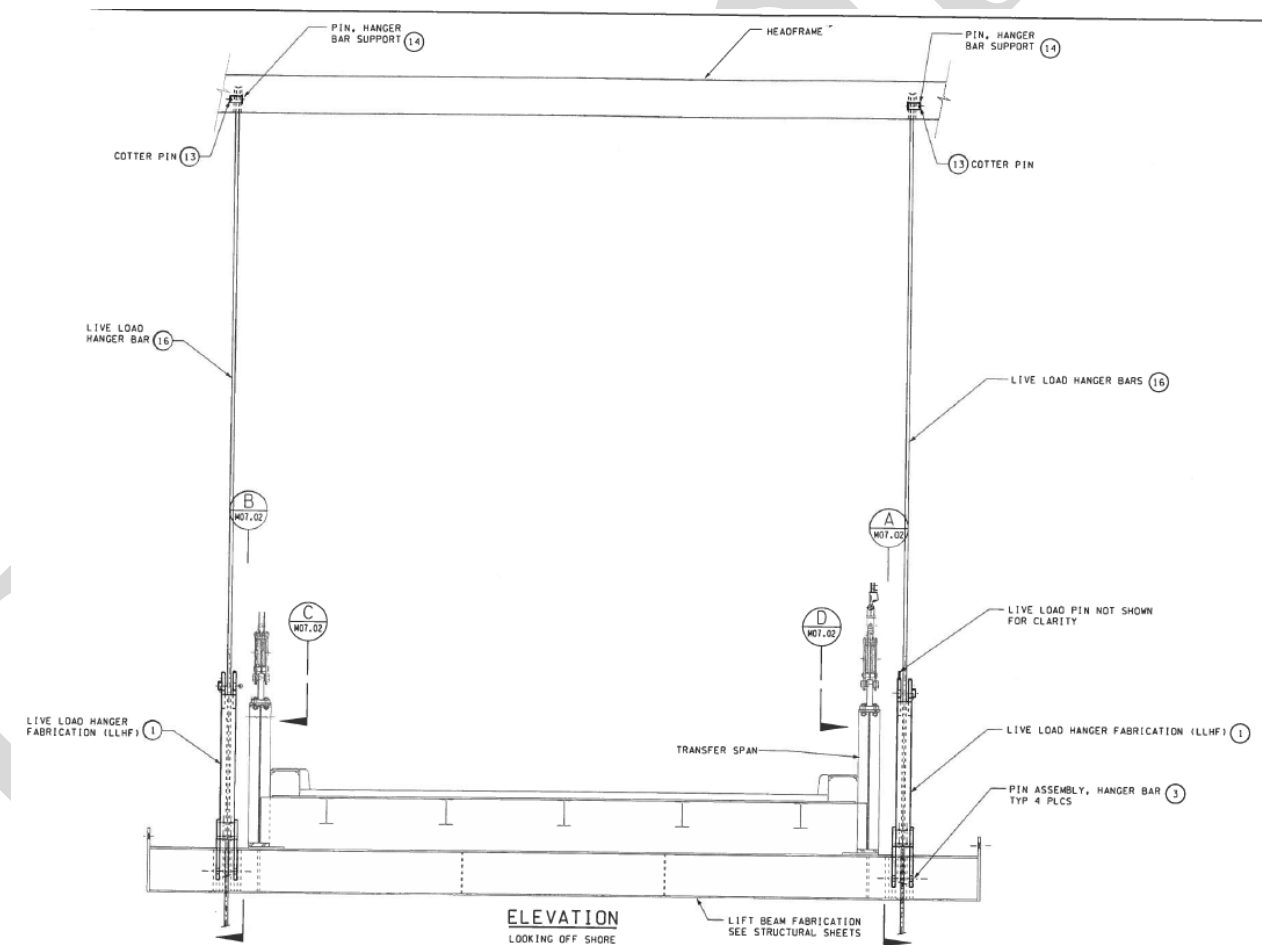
Loading Bridge Cross-Section with Hanger Bars Labeled.
